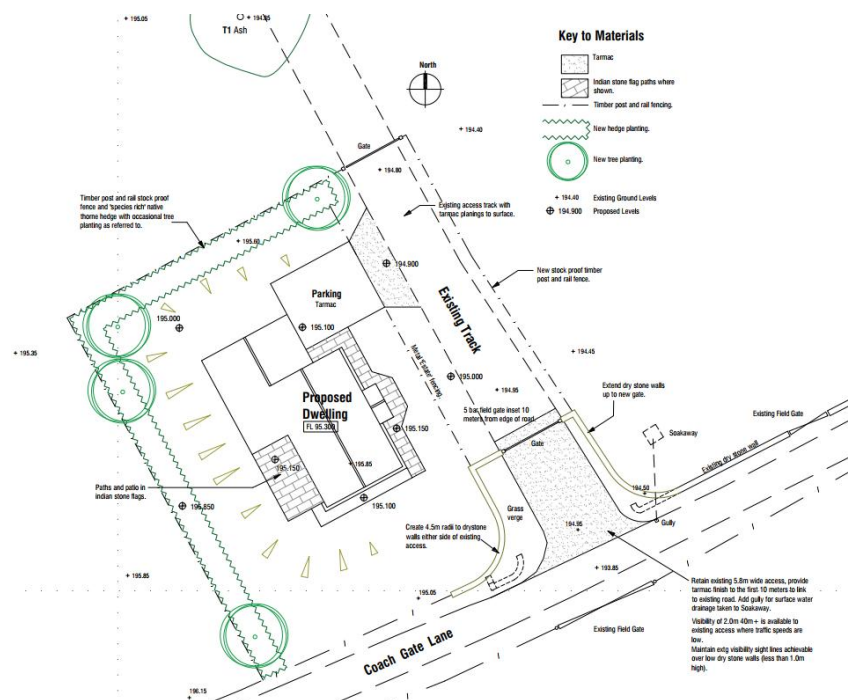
Extract from Site Plan. The front of the house is east facing and has two parking spaces; there is a small garden area to the south and west.
